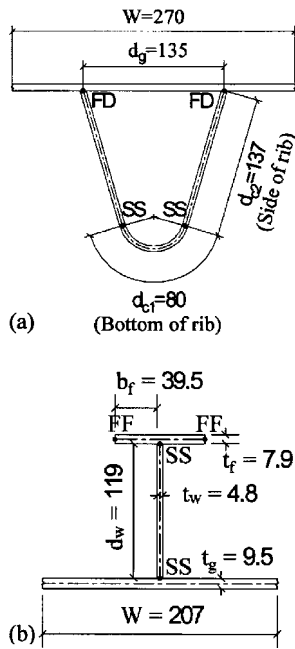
Dimensions and boundary conditions of strut component: (a) Specimen 1; and (b) Specimen 2
